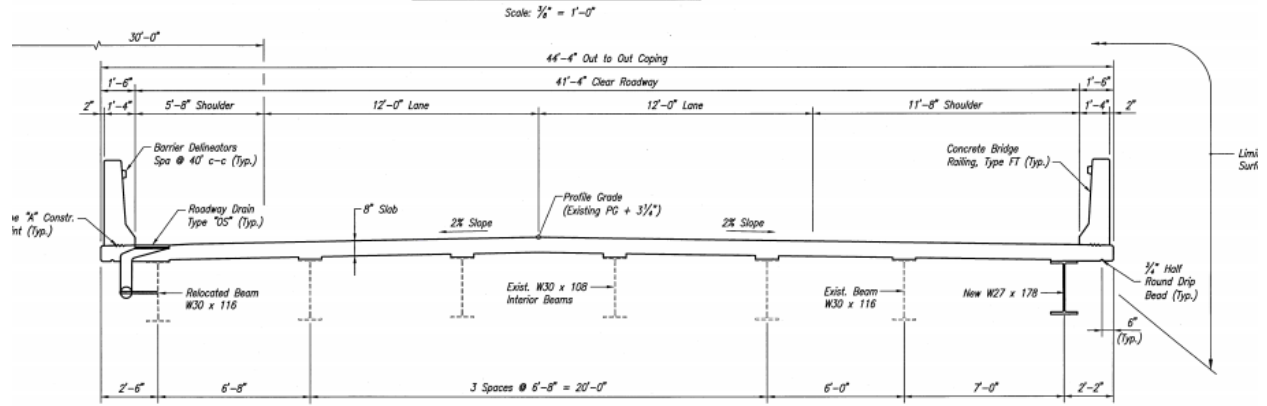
Typical Section of the Bridge (NBI 41230) (2015)
